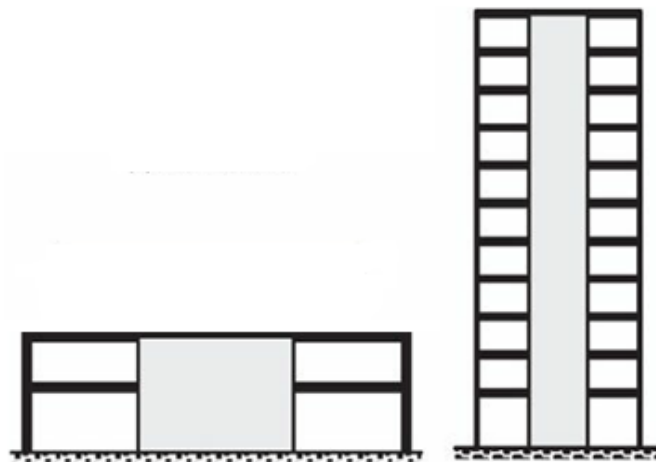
Sample structural wall configurations (Moehle, 2014)
